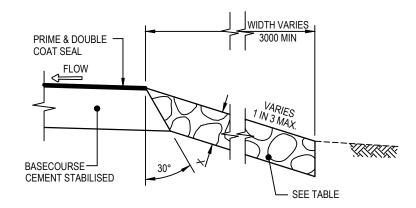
DETAIL ① GEOFABRIC DETAIL AT ROCK PROTECTION FLOODWAY TYPE 2
